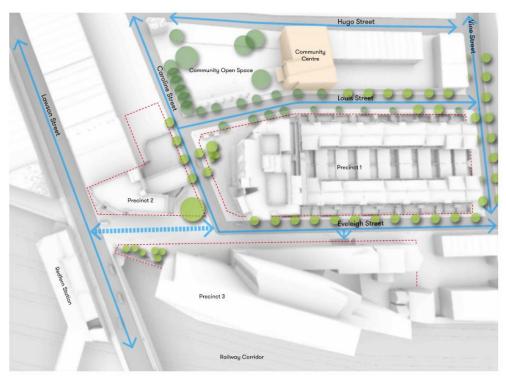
Precincts 1, 2 & 3 proposed buildings
